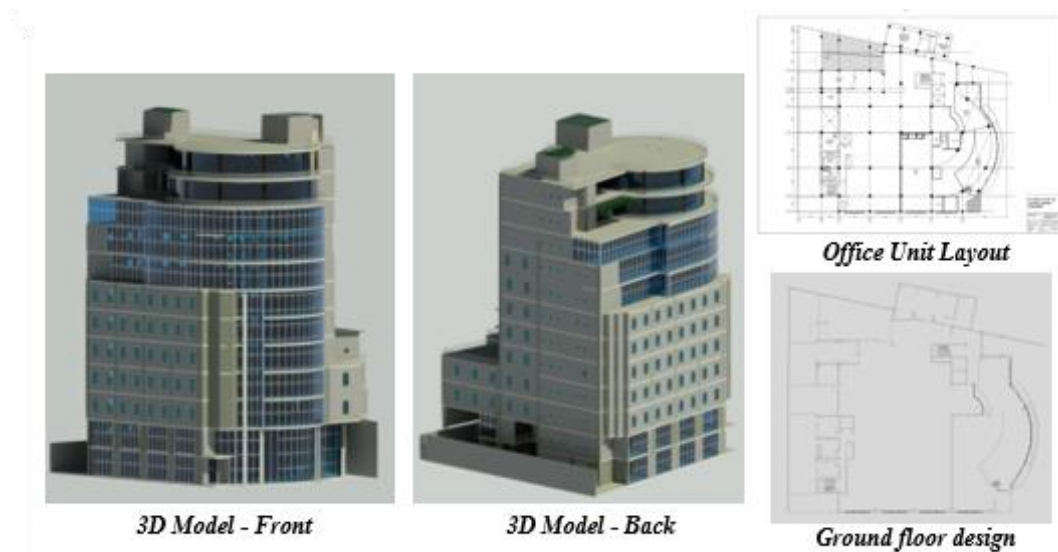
Architectural layout of the selected building, site plan, unit layout, and ground floor design
